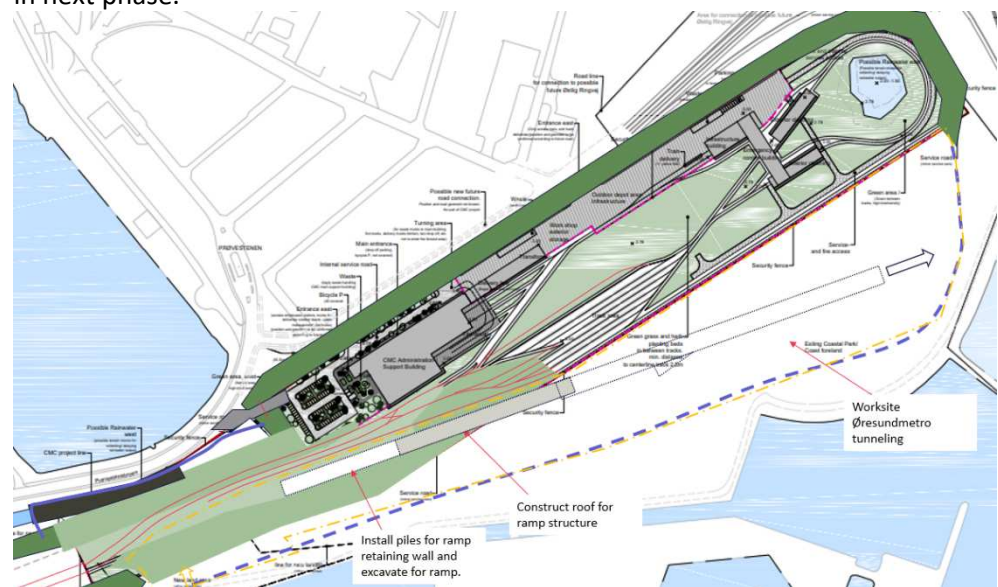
Phase 9 - Øresund metro Ramp Construction Sequence.
